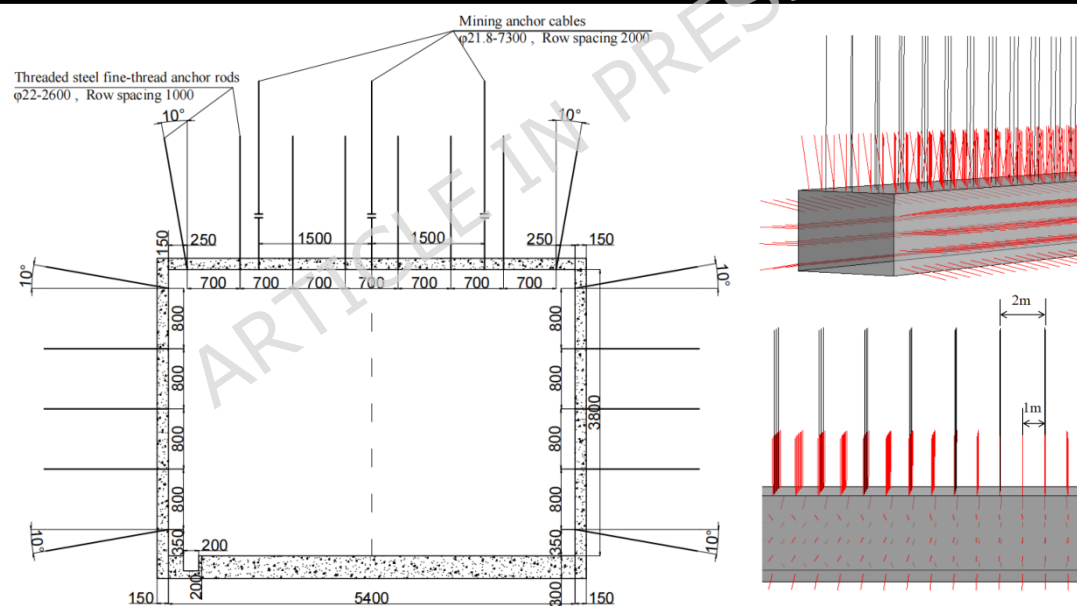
Schematic diagram of cross-section shape and anchor bolt/cable arrangement for North Wing Auxiliary Transport Tunnel
